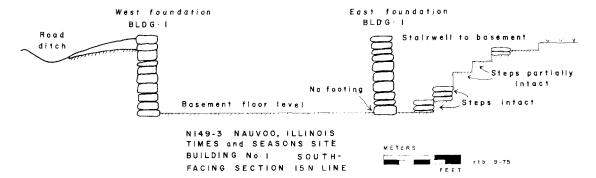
Building 1: south-facing section through 15N line, showing stairwell.
